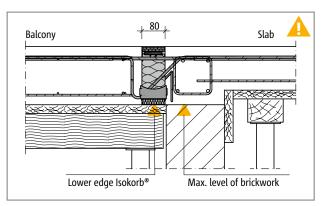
Schöck Isokorb® T type K-E, K-T: In-situ concrete construction with height offset floor on masonry wall
